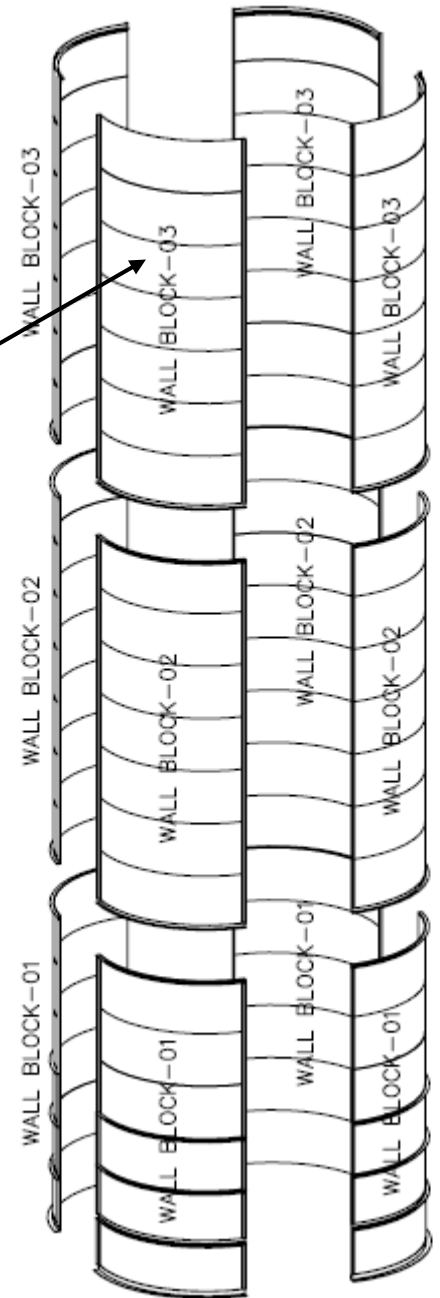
Bent steel pieces used to create cylindrical holding tanks
